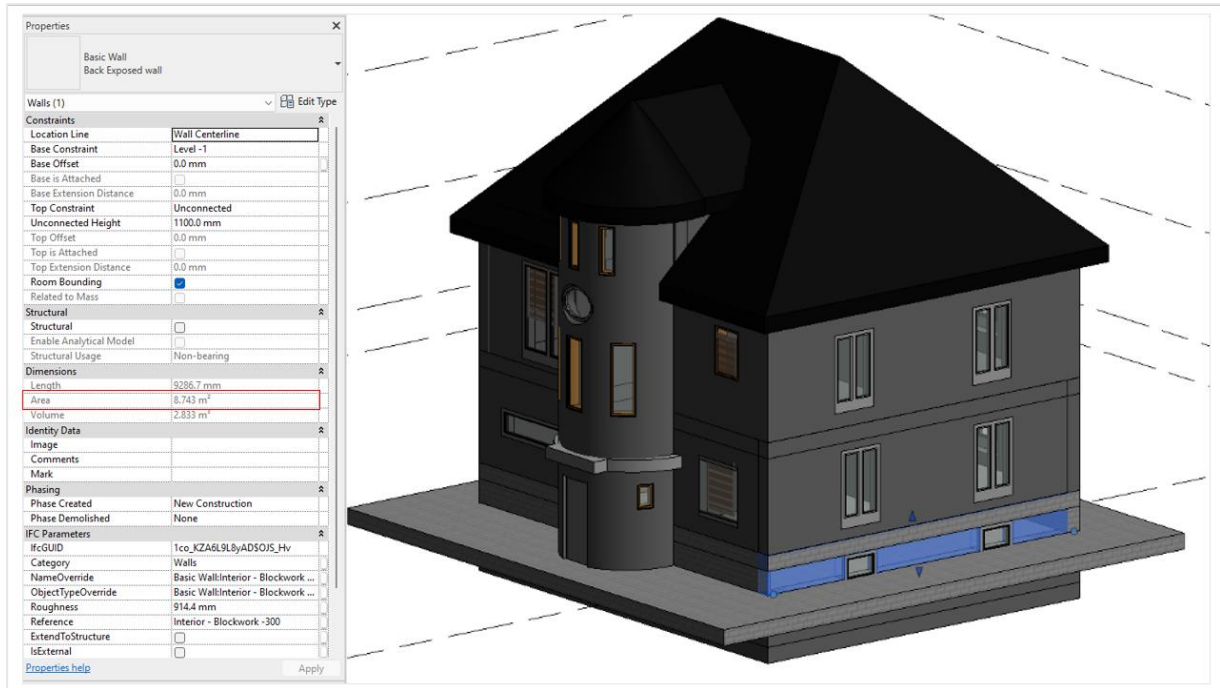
Left exposed basement wall outer face area in BIM model in Revit
